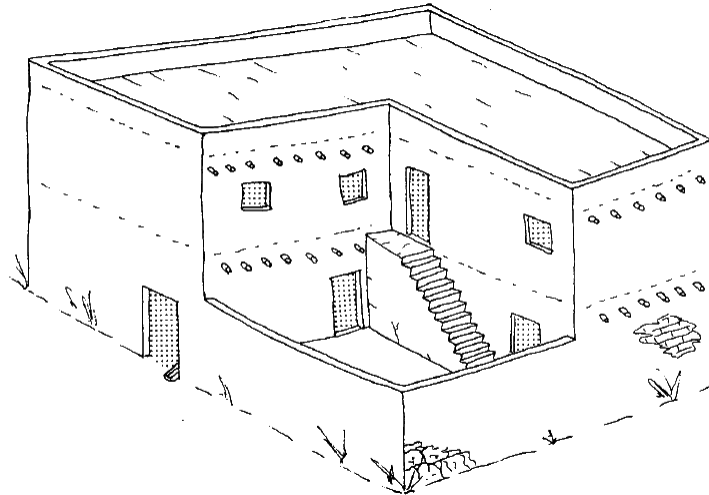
Reconstruction of a house in Monte Sirai, with flat roof (BARTOLONI 2004)
